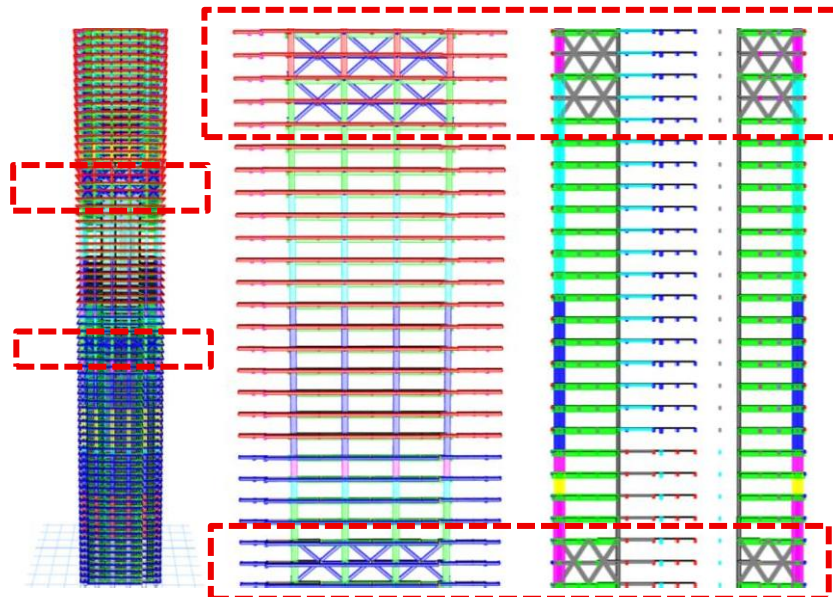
3D Visual and Appearance of The Belt Truss and Outrigger Structure of Model 1
